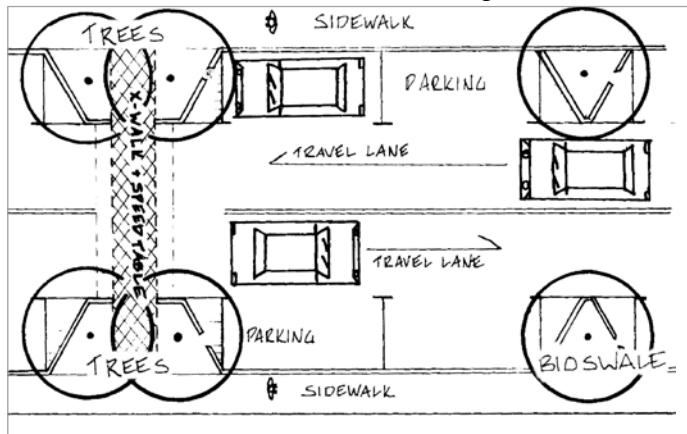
CROSSWALKS AND COMMERCIAL ON-STREET PARKING: Raised and resurfaced crosswalks are surrounded by street trees.
